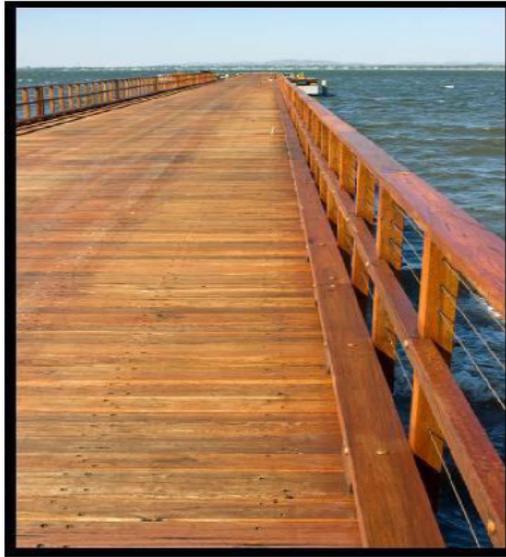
Completed Moreton Bay Jetty – Deck and Handrailing
